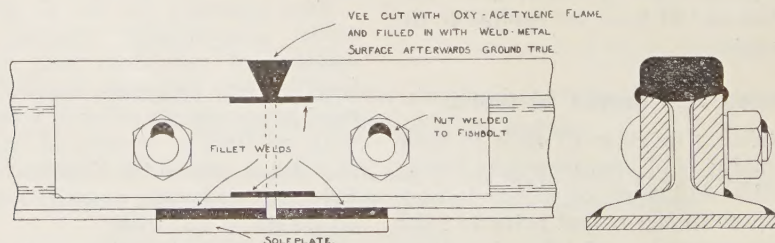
Welded rail joint. — South African Railways and Harbours.
